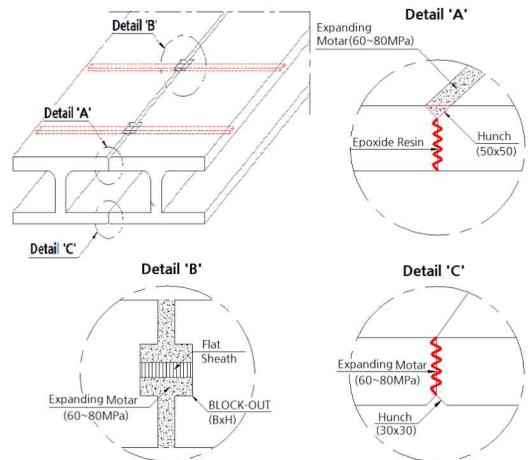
Perspective and detail views of girder arrangement for lateral pre-stressing
